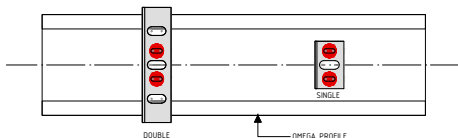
MAXIMUM VERTICAL SPACING BETWEEN ANCHORS TO SUBSTRATE WALL
